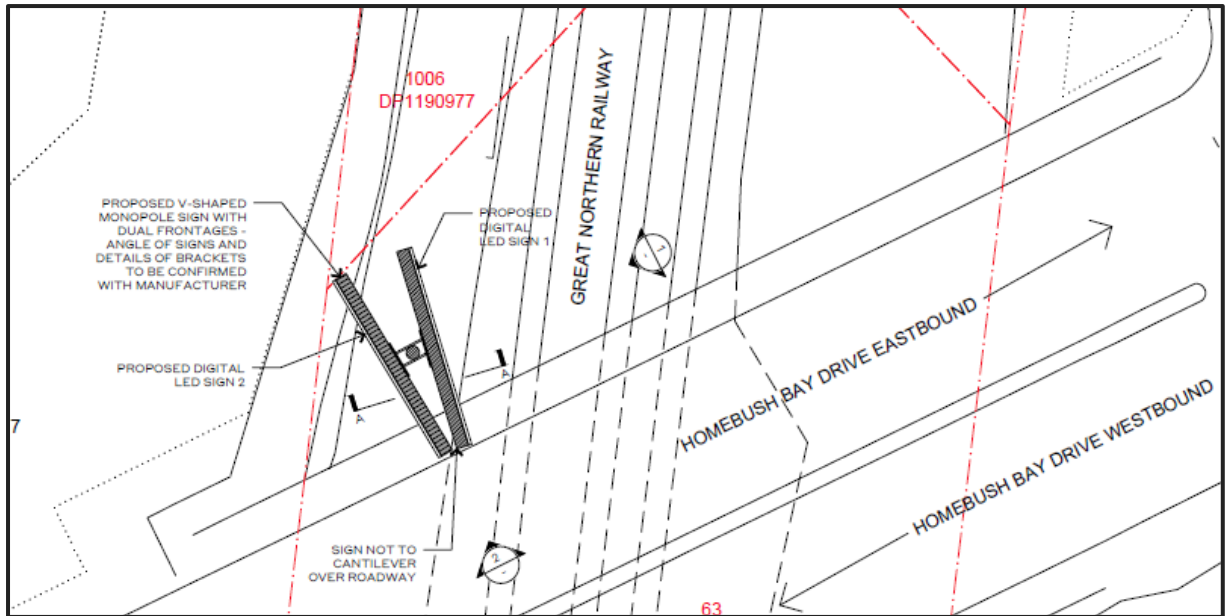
| Proposed plan view (Source: Applicant's FRtS)
